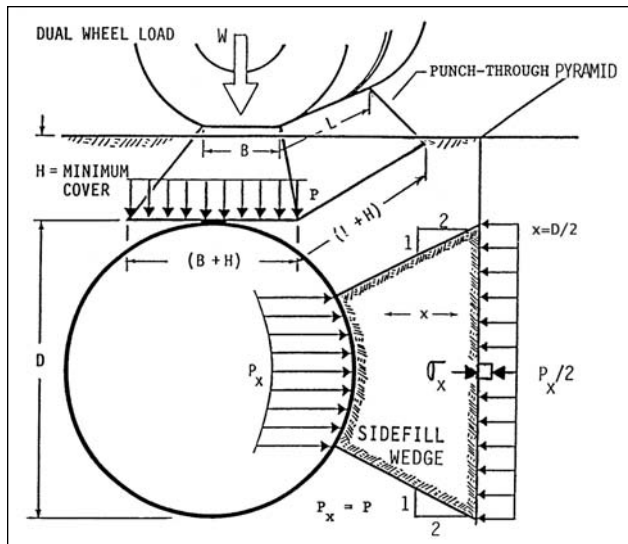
Trench wall support required for ring stability when a wheel load passes over a circular, flexible pipe with less-than-minimum soil cover. The small support provided by poor soils is adequate.
